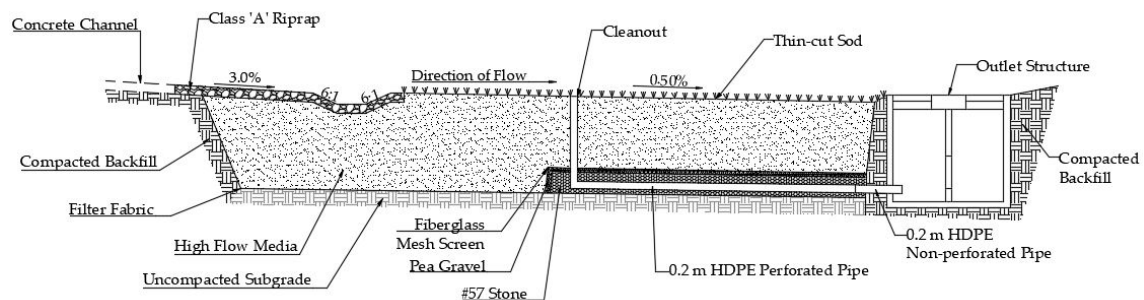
Full structure longitudinal cross-section. Note: not to scale.
